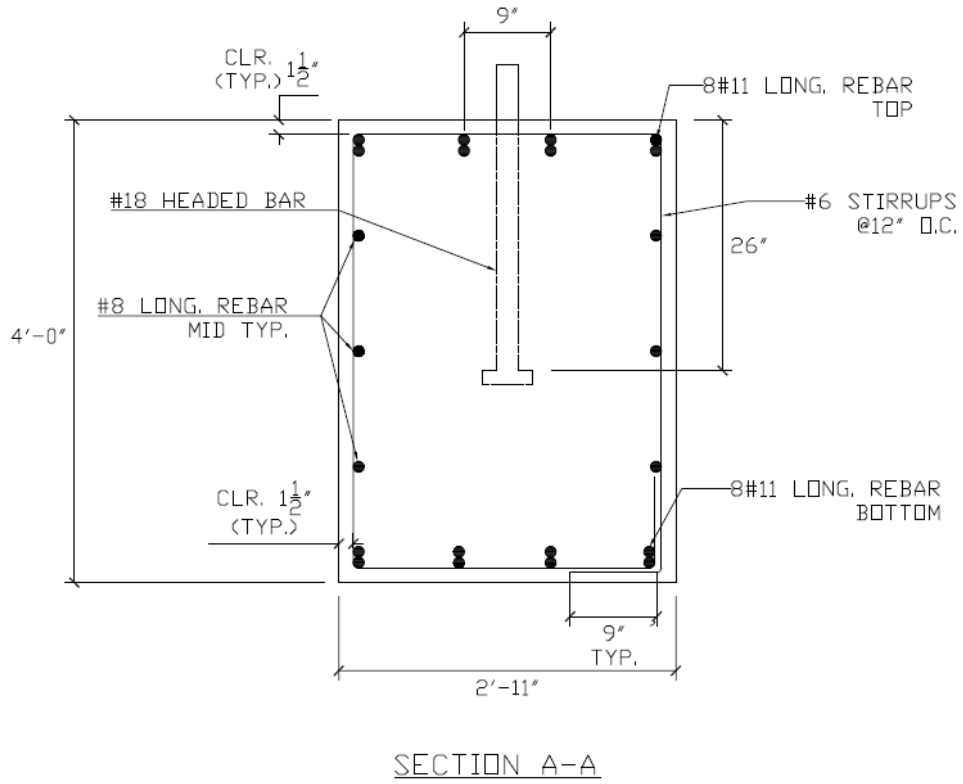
Cross-section view of Specimen 12 (Specimen 13 had the same design but had a bar embedment length of 3'-1")
